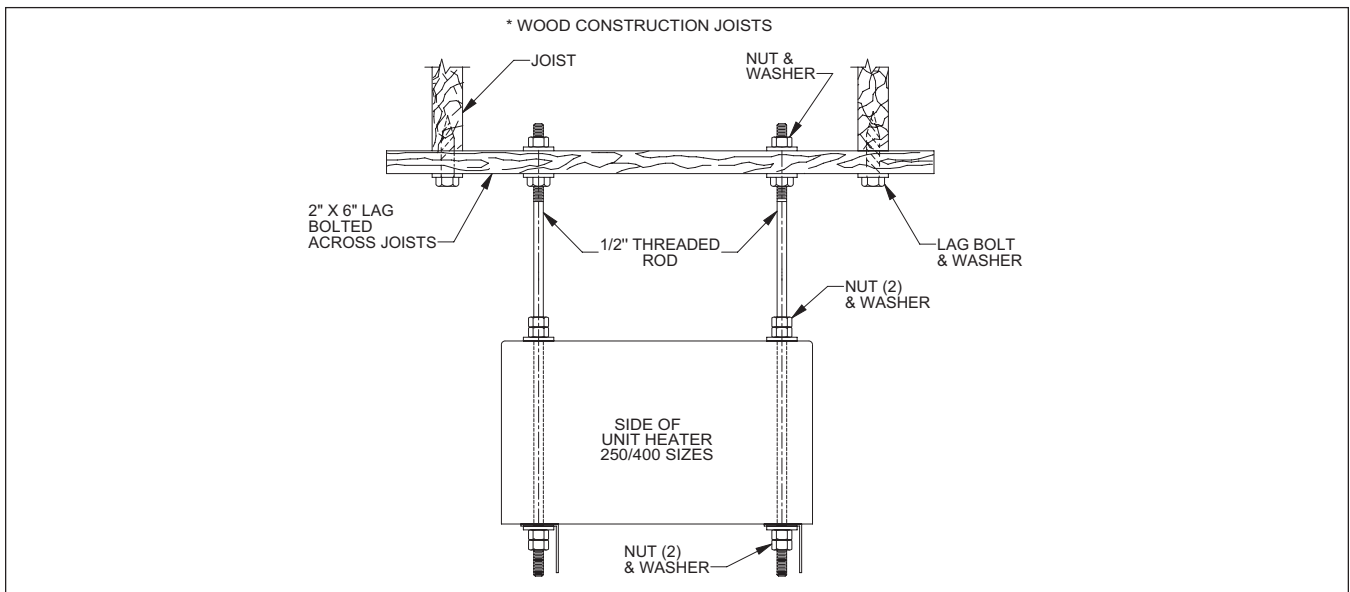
E - Heater Mounting: Wood Construction Joists (for sizes 250/400)
